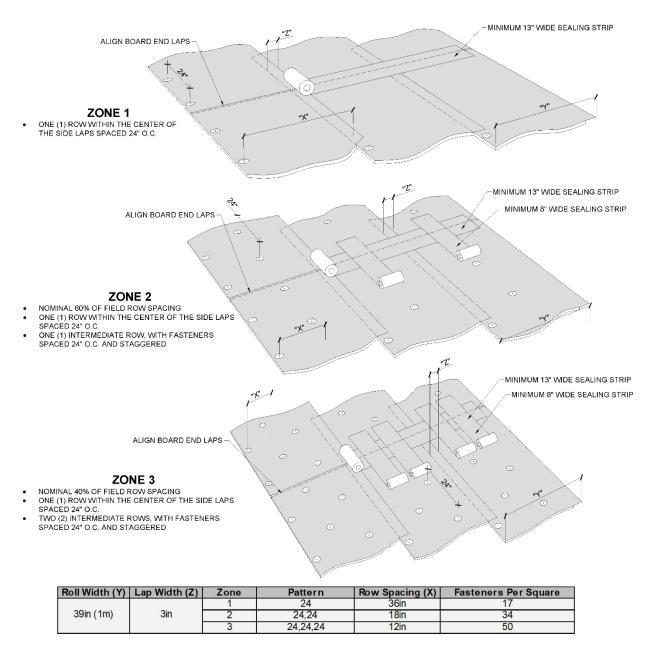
SBS Modified Bitumen Laminated Cover-Board, Mechanically Fastened, 24 in O.C. In Lap Fastening
